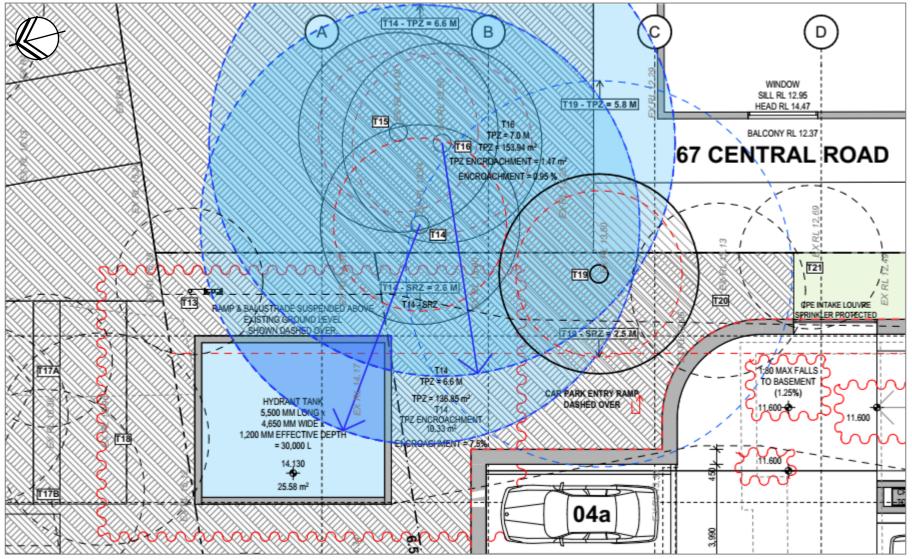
Excerpt of Ground Floor Plan, Dwg no. DA-03, Revision D-P9, dated 12 February 2024, authored by Gartner and Trovato Architects. (NOT TO SCALE).
